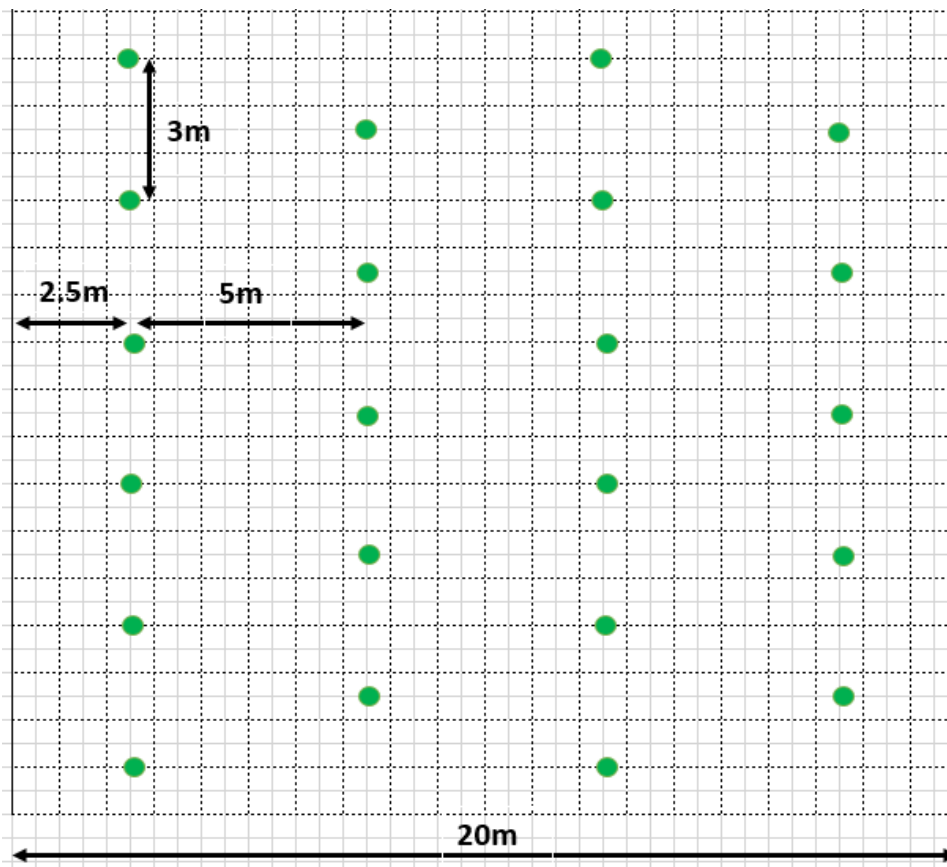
Draft Landscape Plan: Layout Geometry (Source: Draft Landscaping Plan, figure 1, prepared by Oz Trees)
